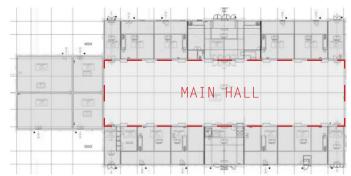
Floorplan of Zuiveringshal West (Source: NIBE, 2013)
